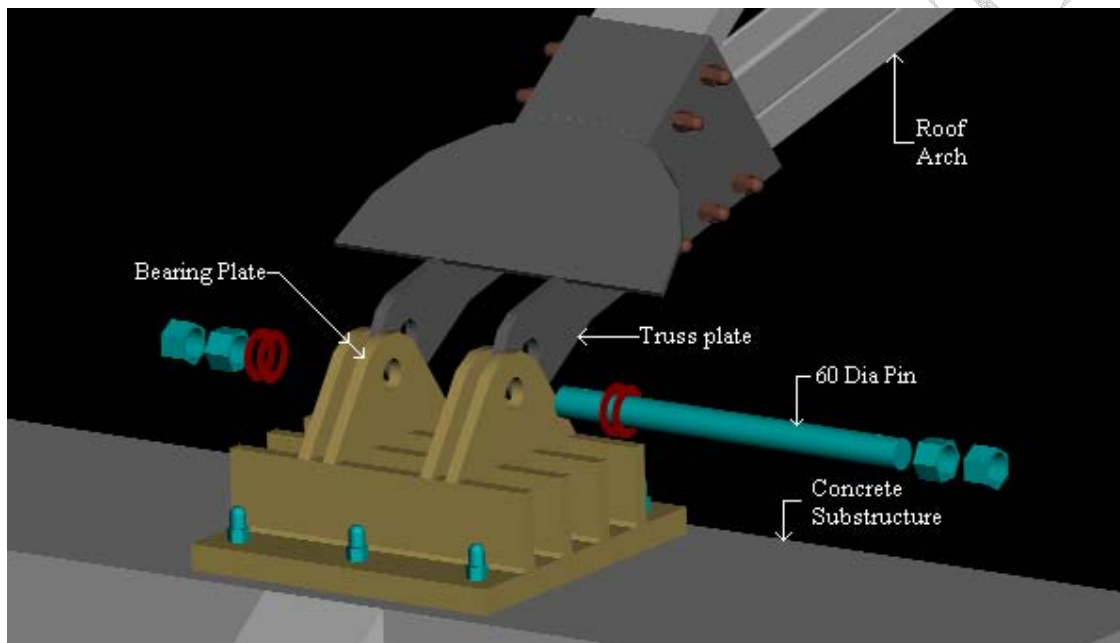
HINGED CONNECTION AT JUNCTION OF THE ROOF AND THE SUPPORTING STRUCTURE
